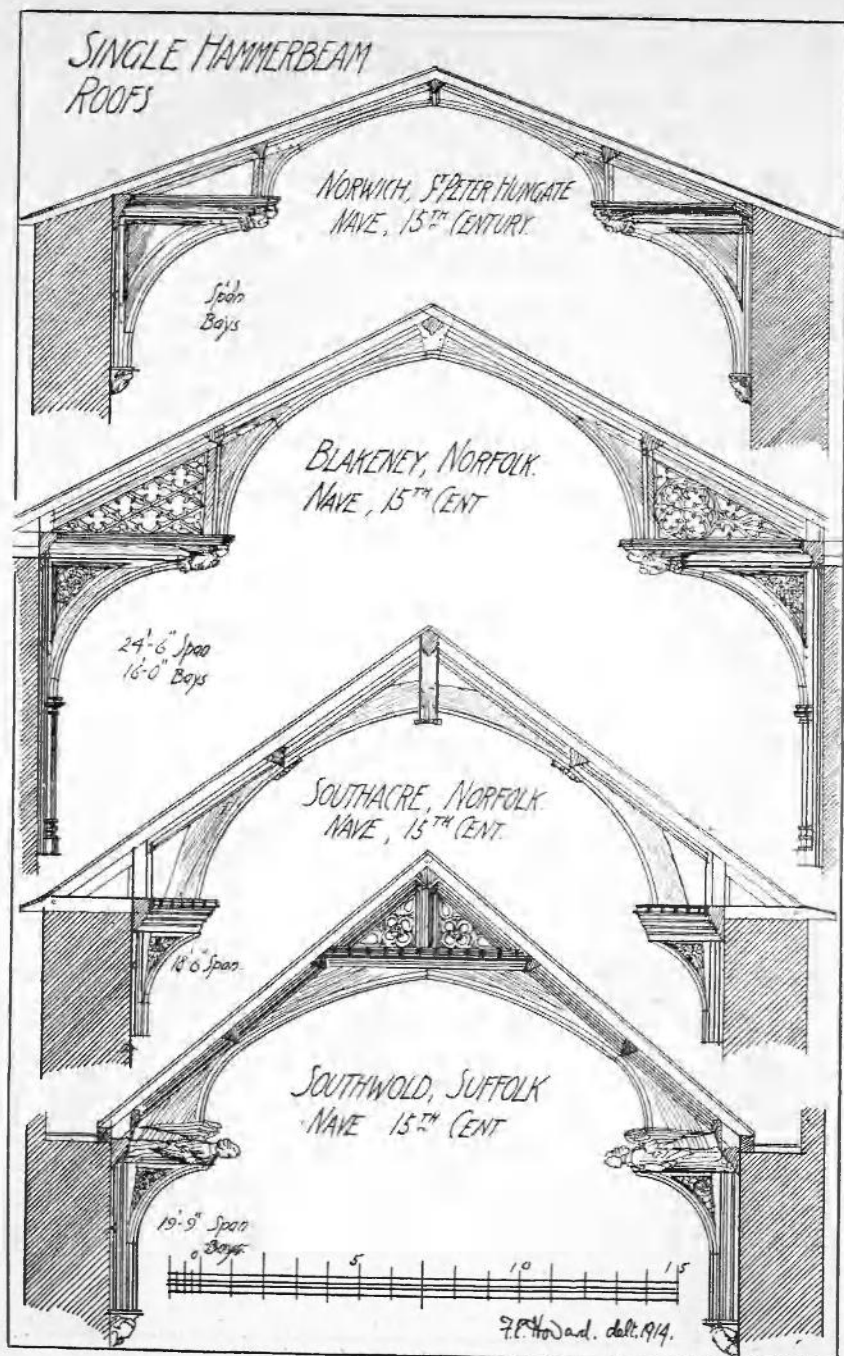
SINGLE HAMMER-BEAM ROOFS.
